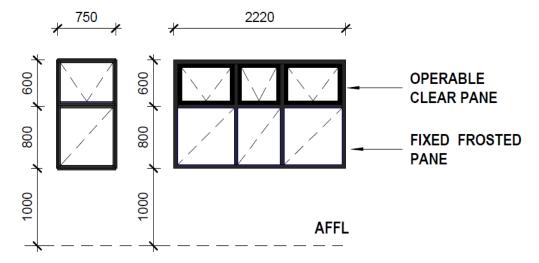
Proposed windows facing internal courtyards within the subject site, with fixed, obscureglazed windows to 1.8m and operable windows above
